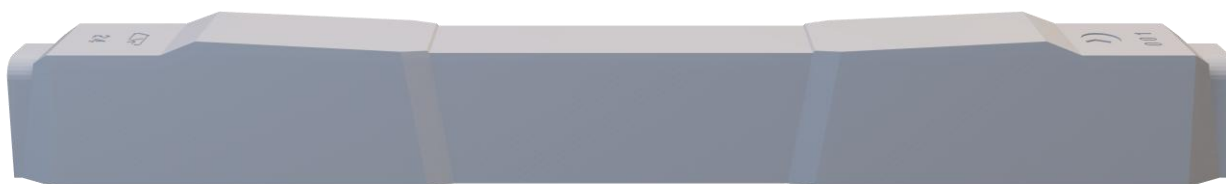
RN-246-18 Concrete sleeper – fastenings and shoulders not shown
